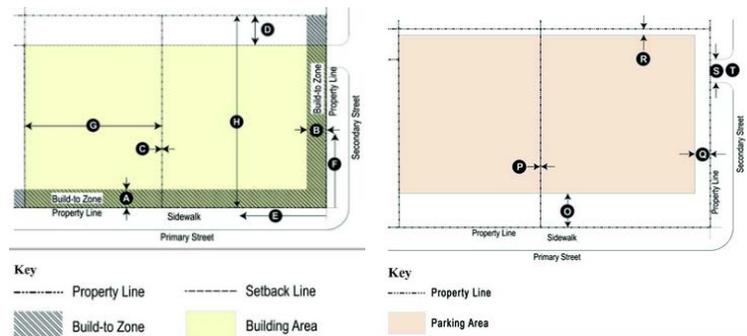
NRH Building setback diagram (left) combined with parking setback (right)
